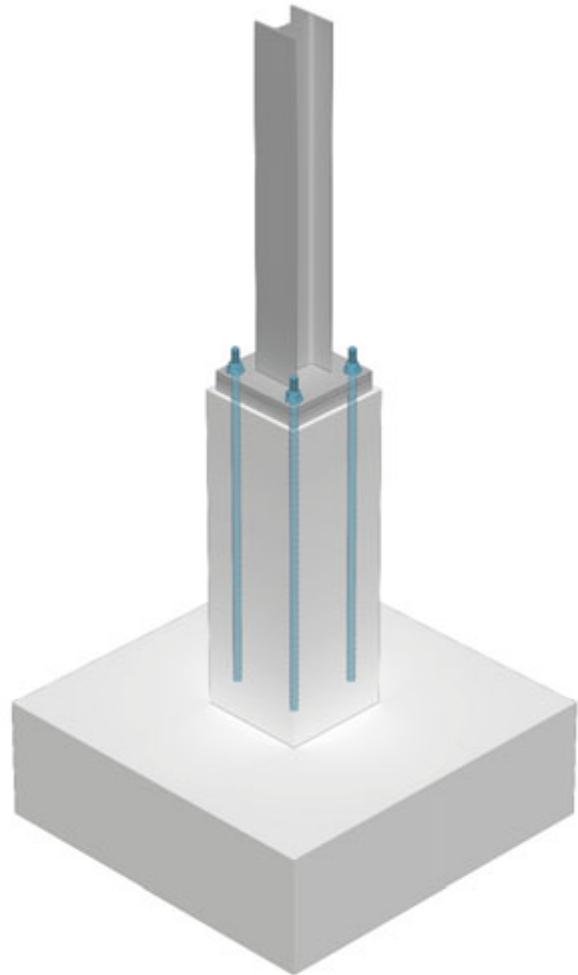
HPM P Anchor Bolts in a steel column to pedestal connection.
